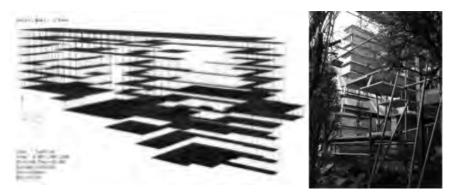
Iz House, Stacked structure of glass and acrylic resin walls. Architect: Sou Fujimoto, Structure : Jun Sato.
